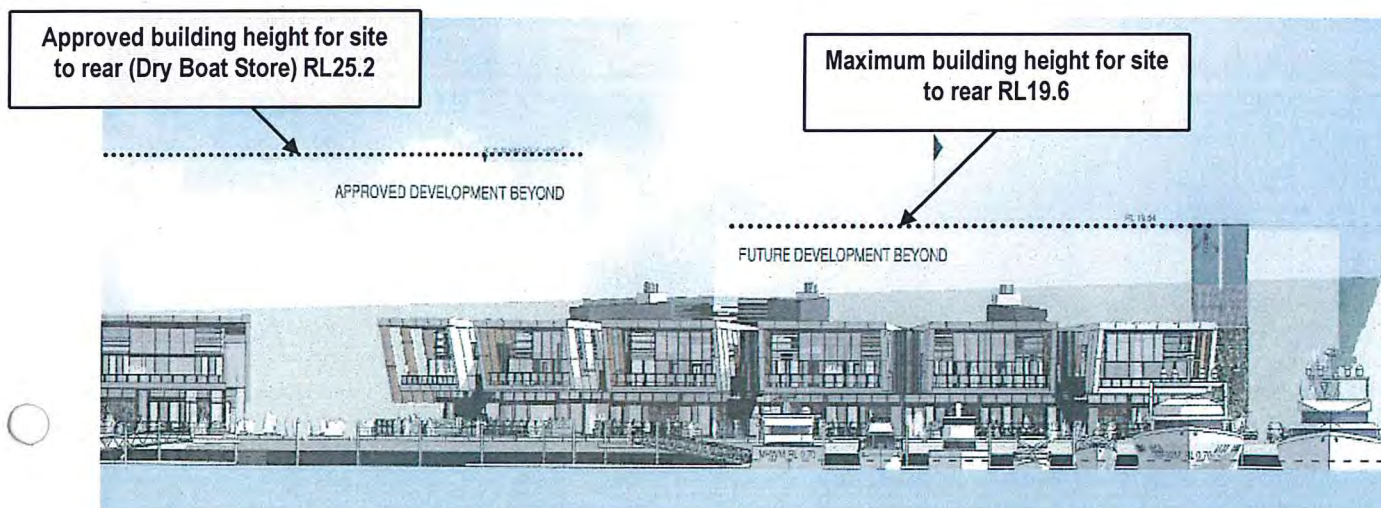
Proposed building heights against Master Plan requirements (Source: PPR)
